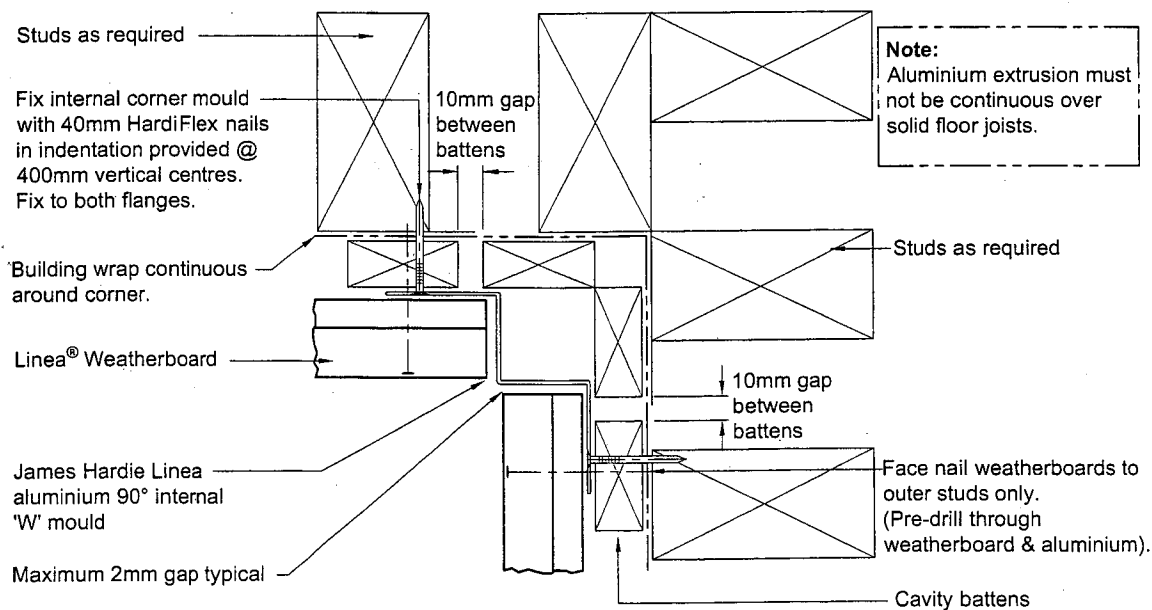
CAVITY INTERNAL 90° ALUMINIUM 'W' MOULD CORNER
